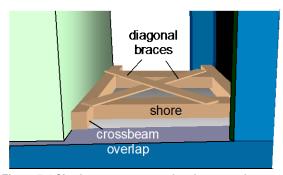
Shoring arrangement showing cross beam overlap and diagonal braces
